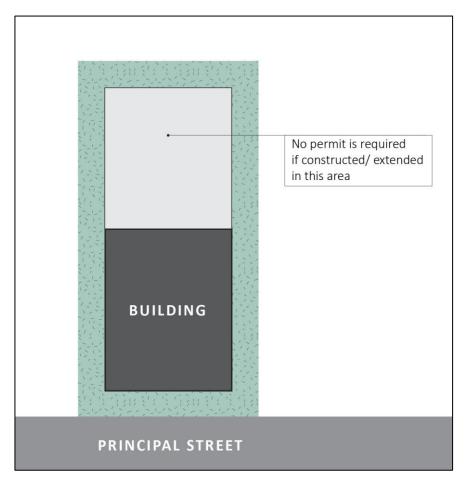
Construction of a single-storey addition or extension to an existing building is exempt if located in this area
